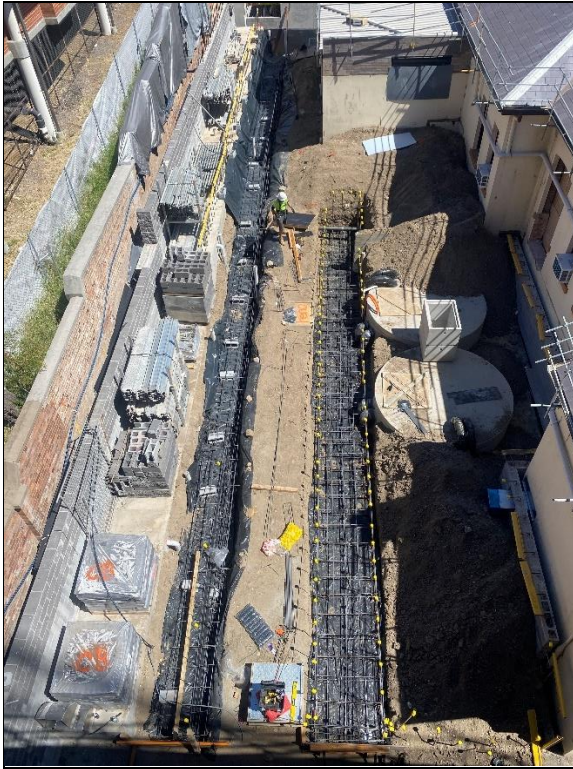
Black plastic marker layer beneath concrete footings at rear of central building. Rainwater tanks backfilled with site won fill/soil (9 October 2020 - supplied by Built)
